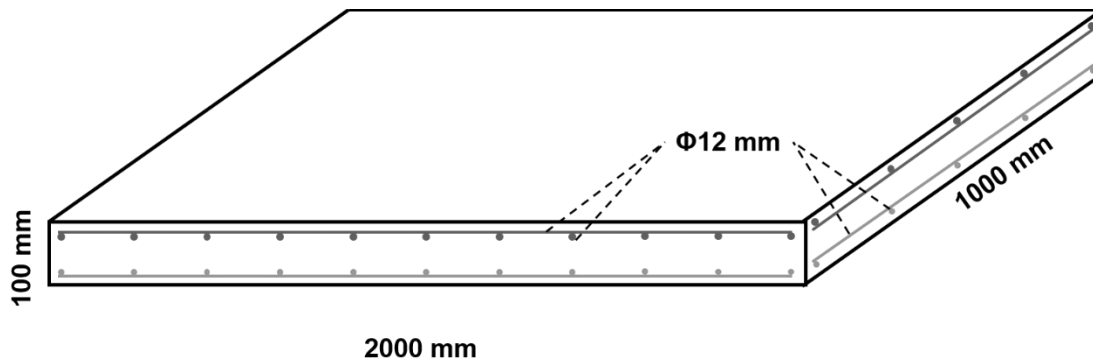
Rebar arrangement of the RC slab tested by [33] (not to scale)
